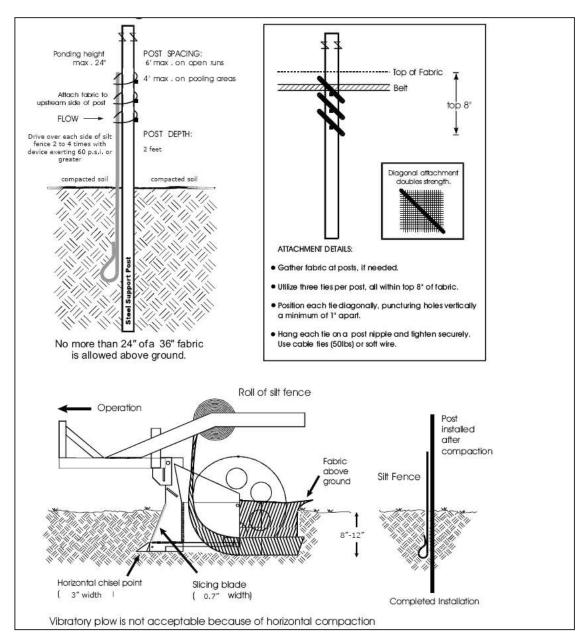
Silt Fence Slicer Installation Details (Adapted from Silt Fence That Works)
